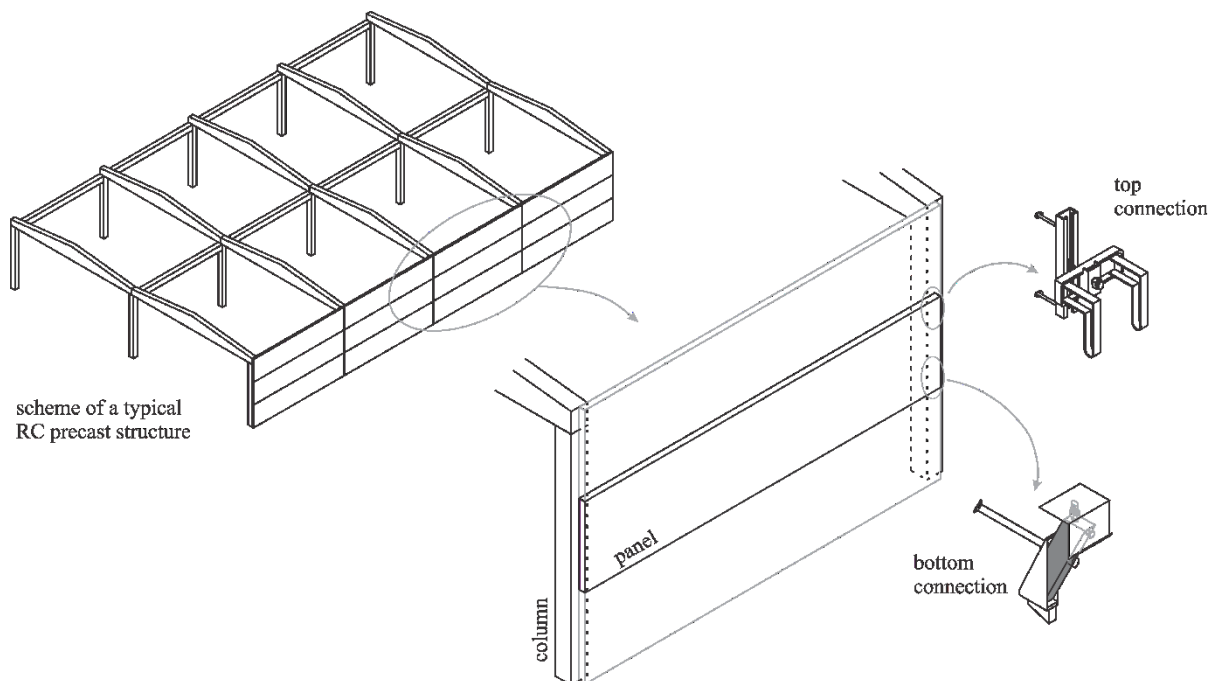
Scheme of a typical RC precast structure with horizontal panels
